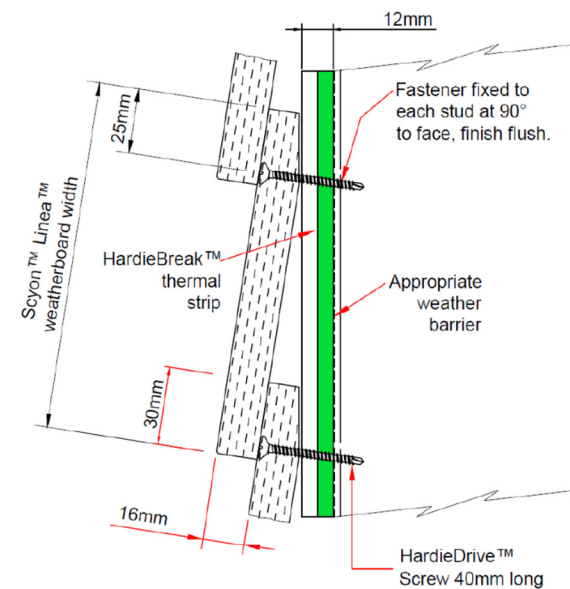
Concealed Fixing Detail (use when bracing capacity not required)
